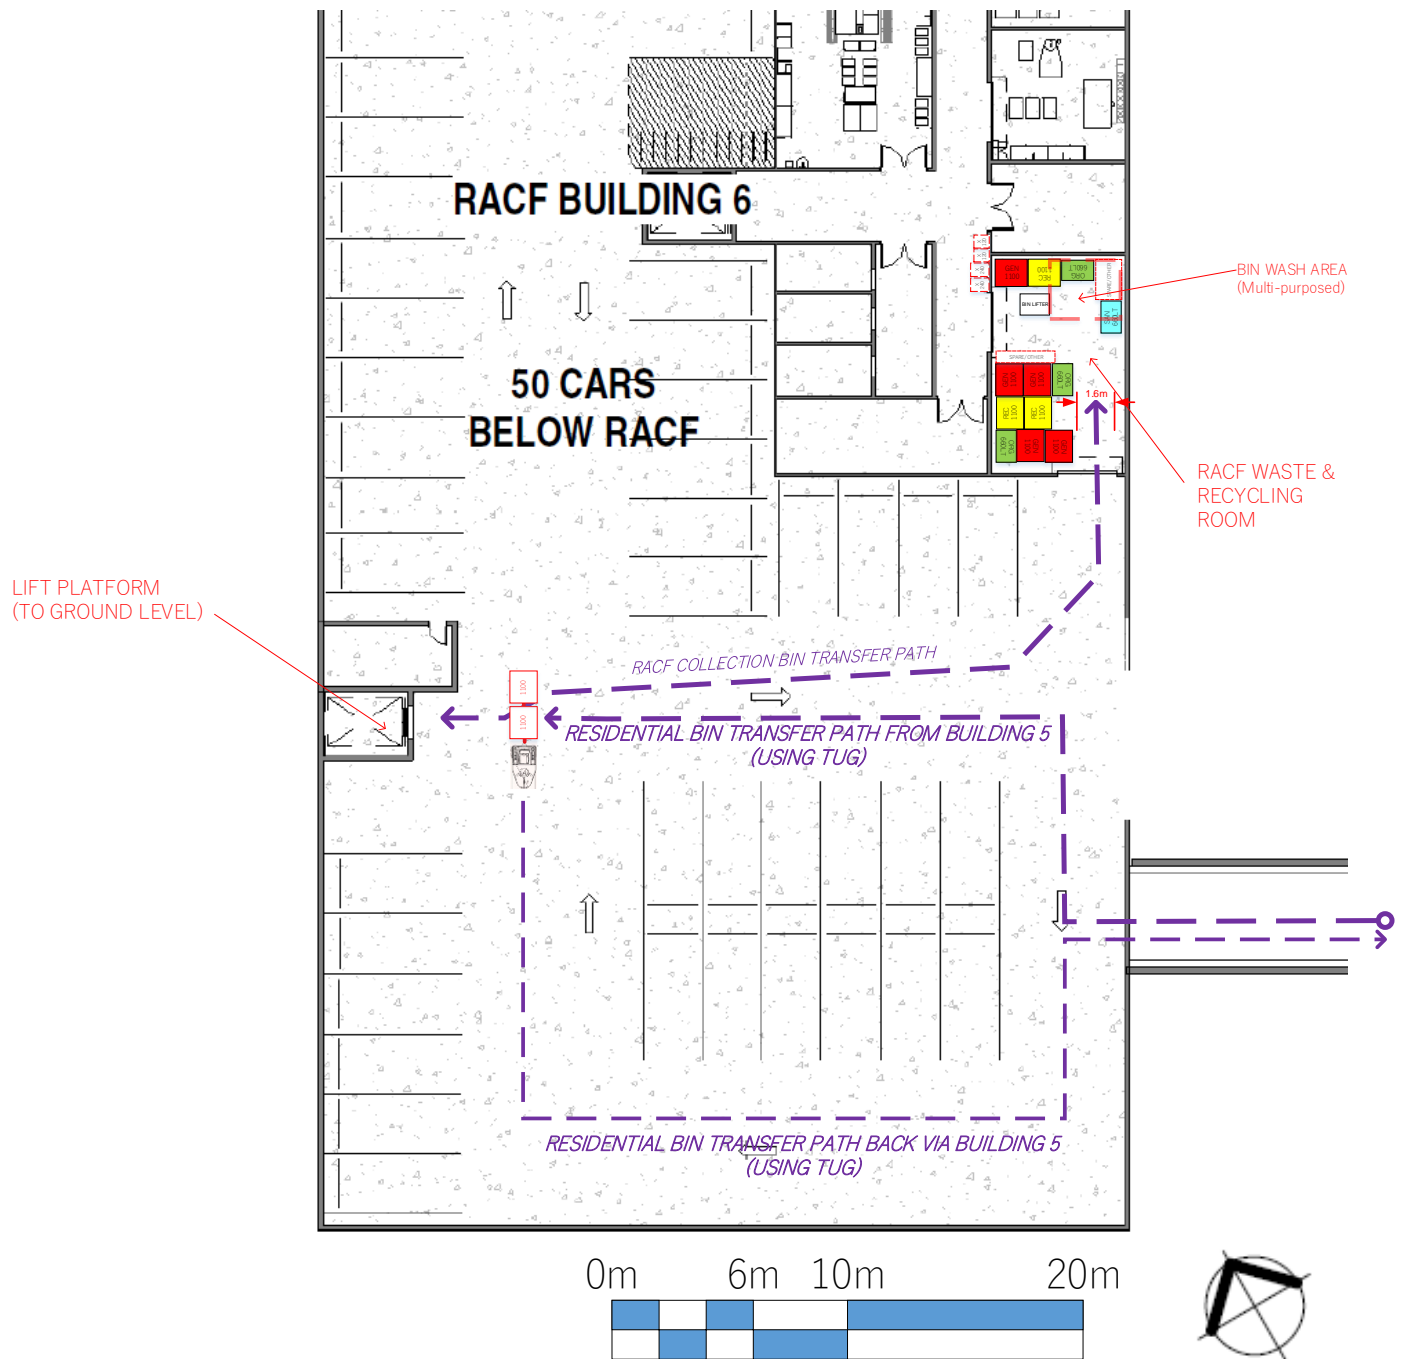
RACF Basement section illustrating RACF waste room, and RACF bin transfer path and residential bin transfer path (through basement from Building 5) to lift platform (which connects to Service Yard Ground Level)
